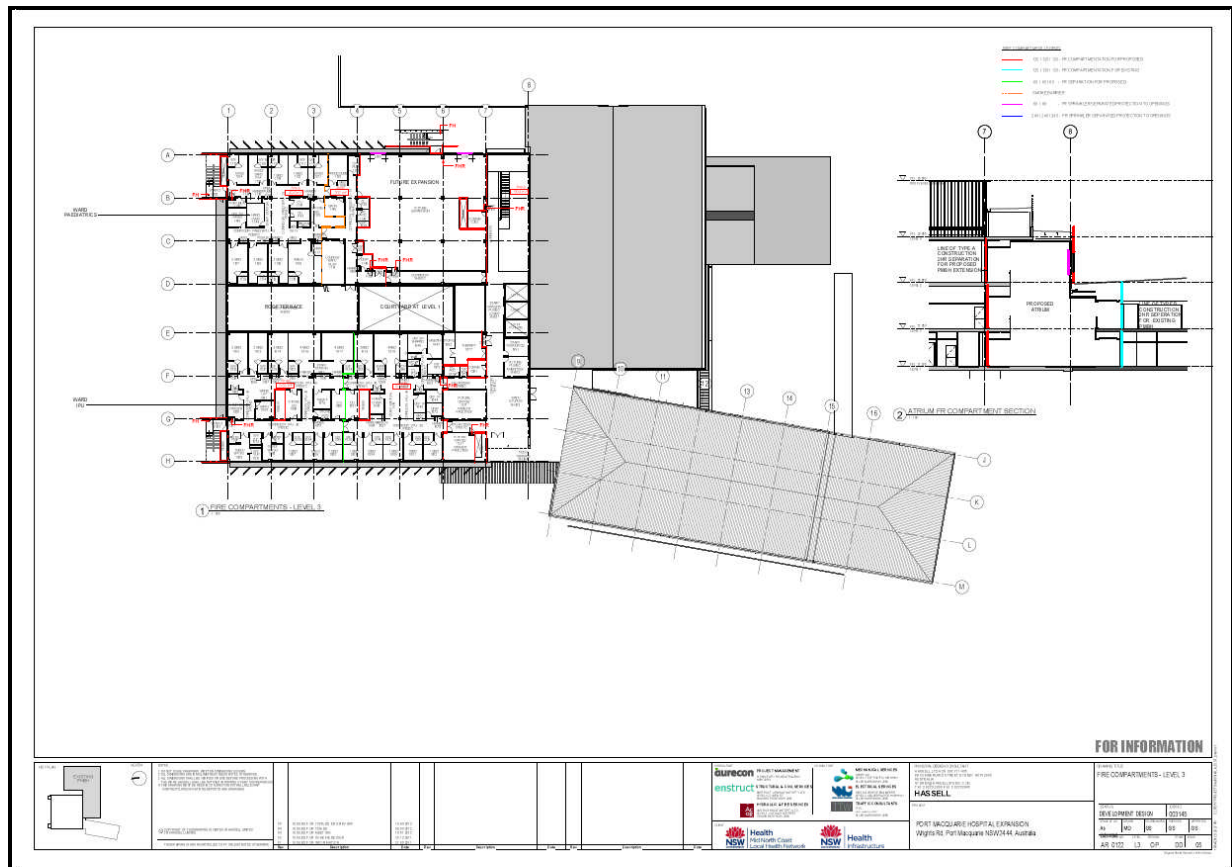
Third Level floor plan showing fire and smoke compartments and external required exits.
